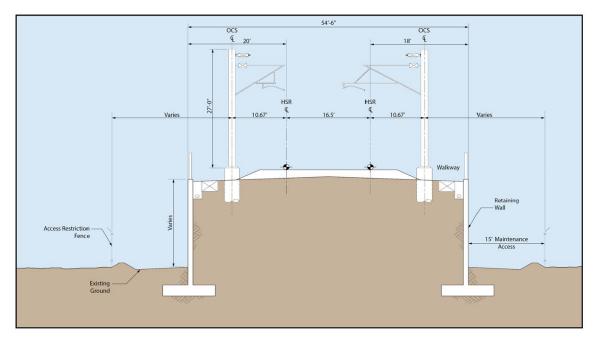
Typical High-Speed Rail At-Grade Cross Section (Fill)
